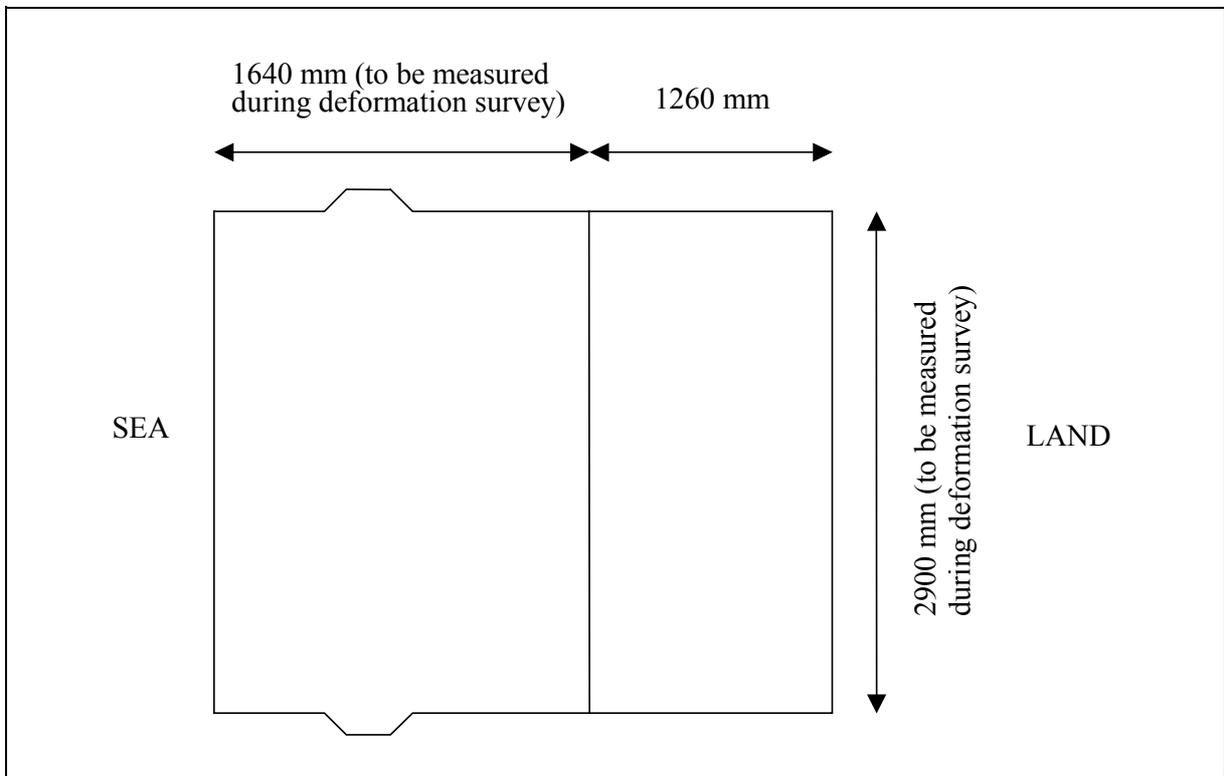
Plan View of a Typical Seawall Block (provided by Consultants)
